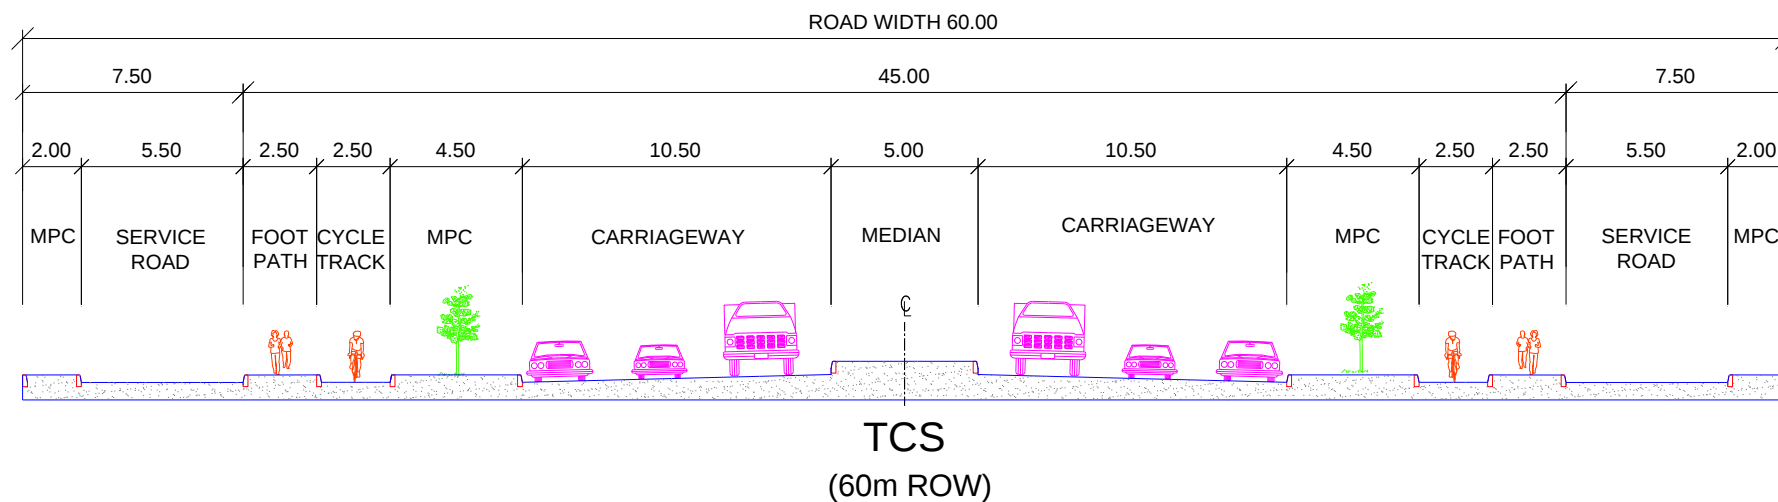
Typical Cross Sections of Arterial and Sub-Arterial Roads
